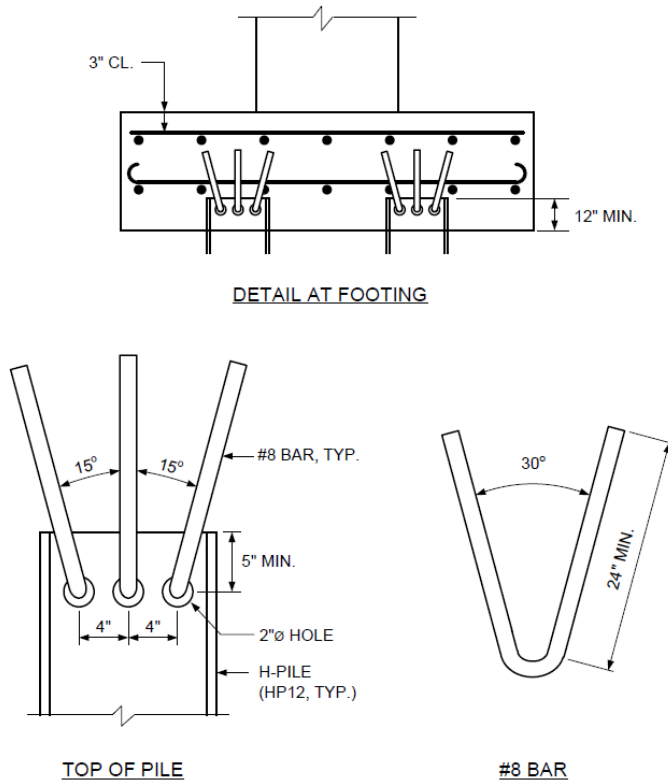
B-3 H-Pile Connection Detail for Seismic Zones 2, 3, and 4
